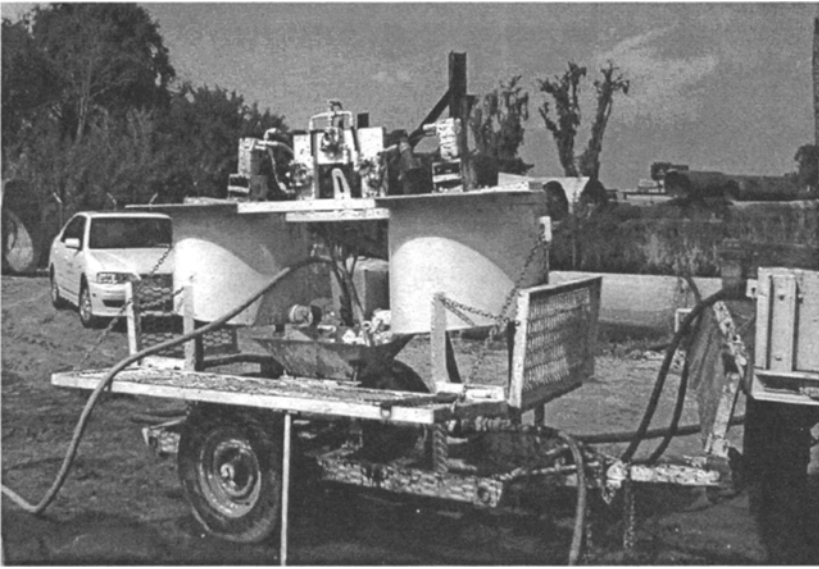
Trailer Mounted Grout Mixing and Pumping System.
